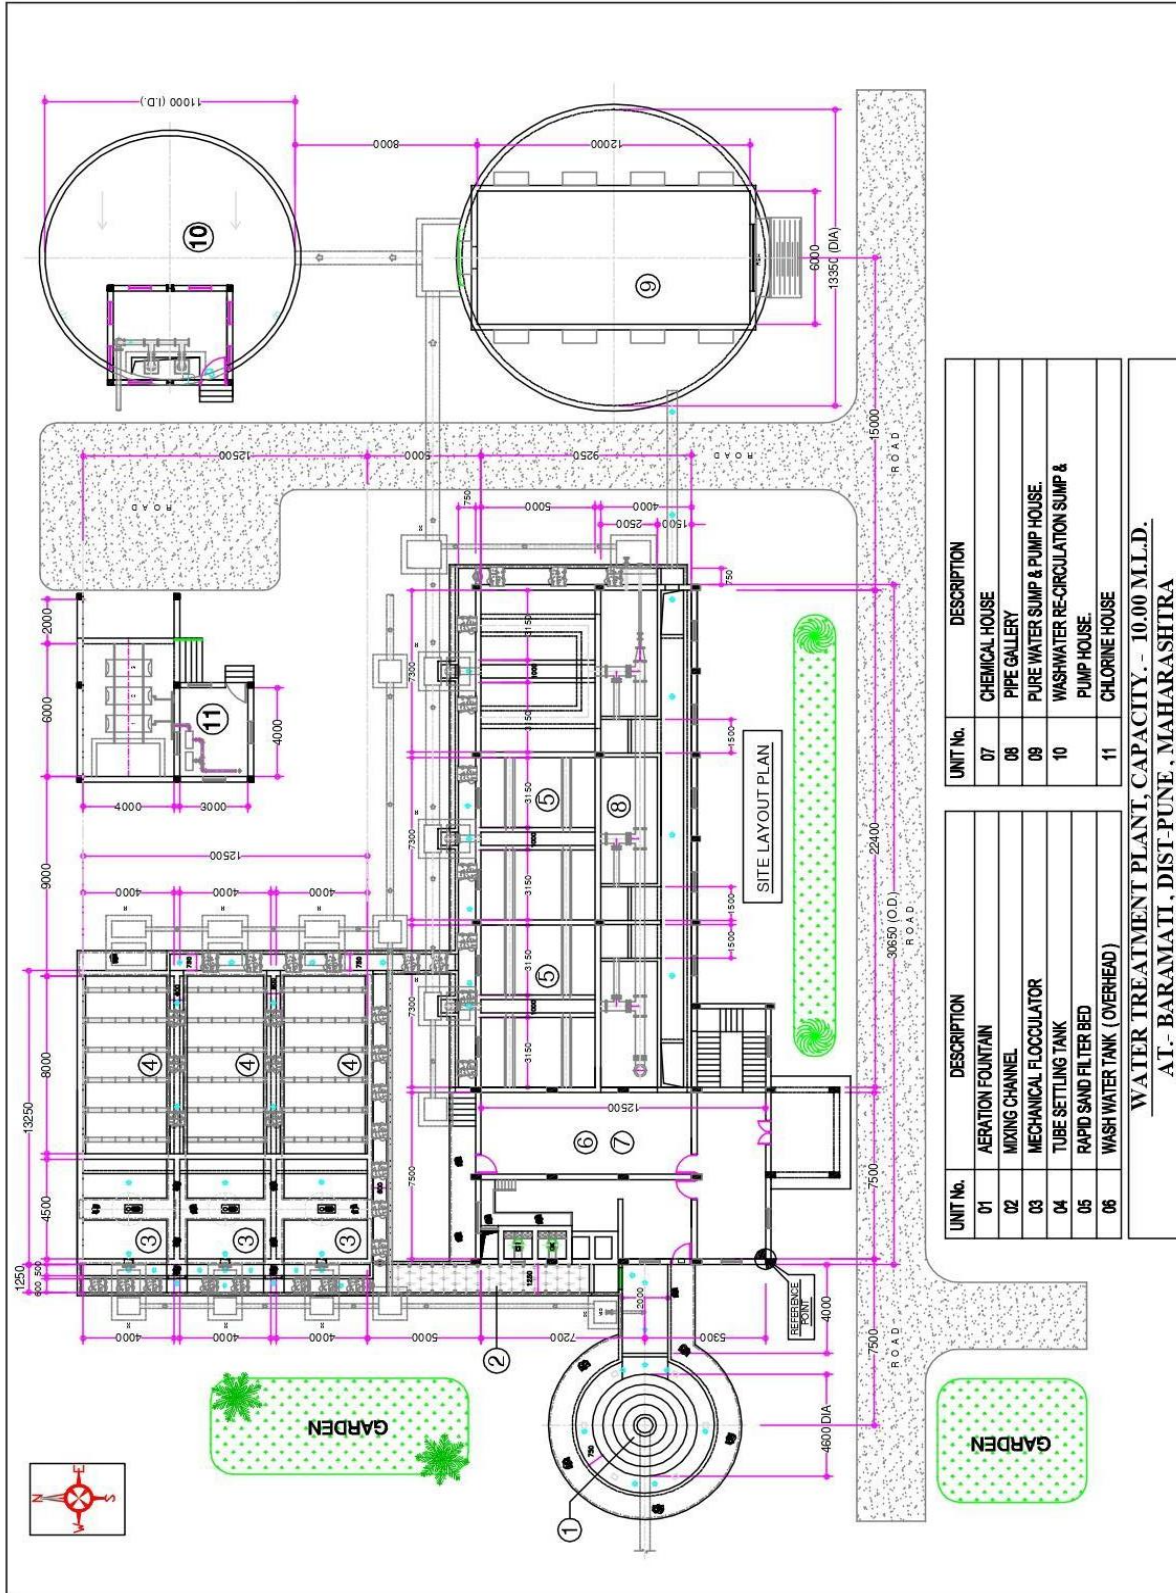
Layout of WTP Capacity 10 MLD at Baramati, Dist. Pune, Maharashtra
